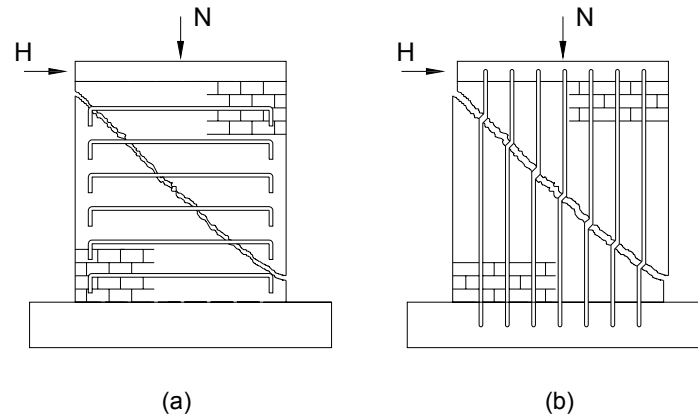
Resisting mechanisms of reinforced masonry walls: (a) horizontal reinforcement and (b) vertical reinforcement (Tomažević, 1999).
